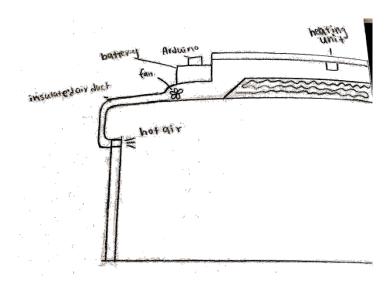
Roof Mounted Air Heater with Arduino Controlled Fan and Door Top Mounted Duct-Work
